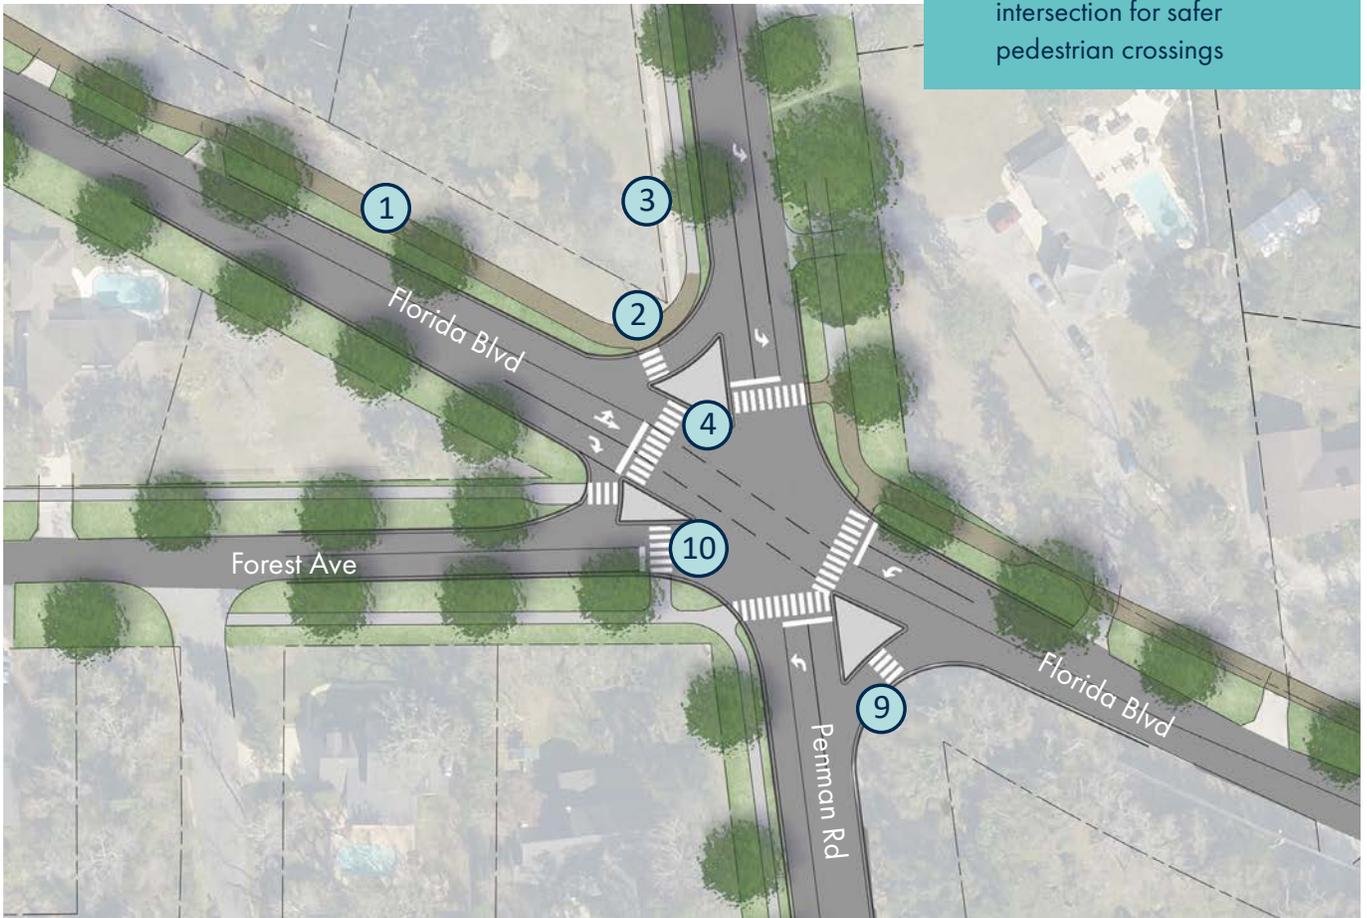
Penman & Florida Intersection: Proposed Signalized Intersection Plan
